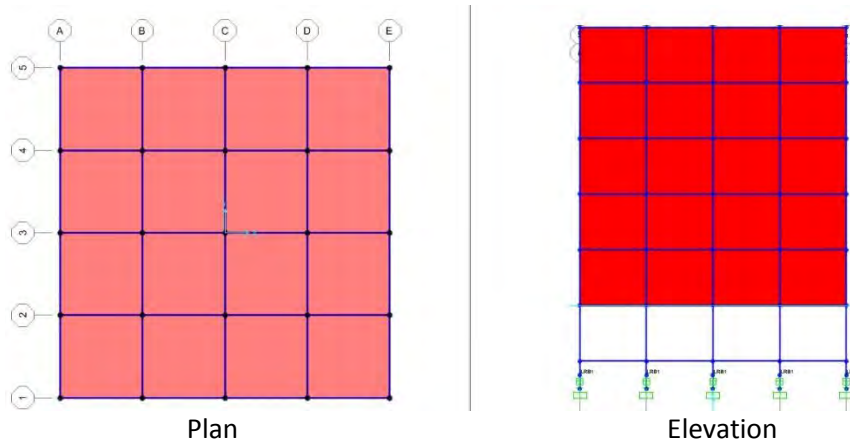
Plan and Elevation of modeled BI Building with Soft Bottom Storey
